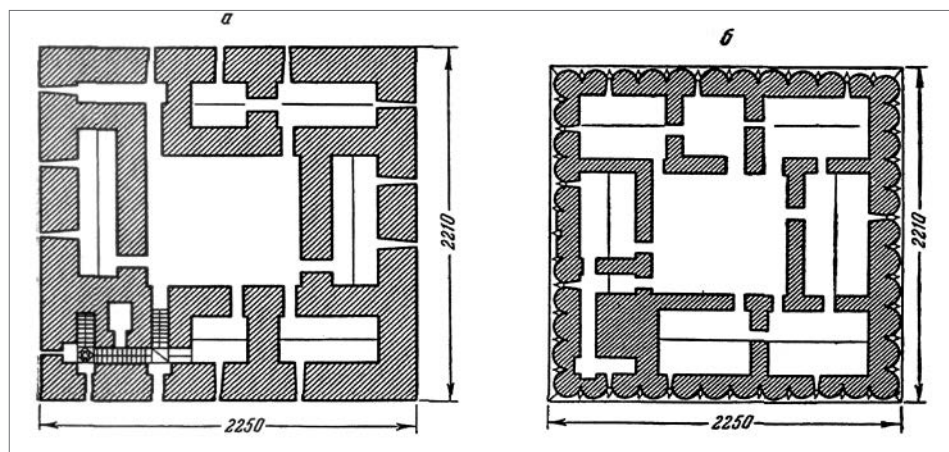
Little Kyz Kala at Merv: plan of the ground (left) and first floor (After Pugačenkova 1958: 138)
